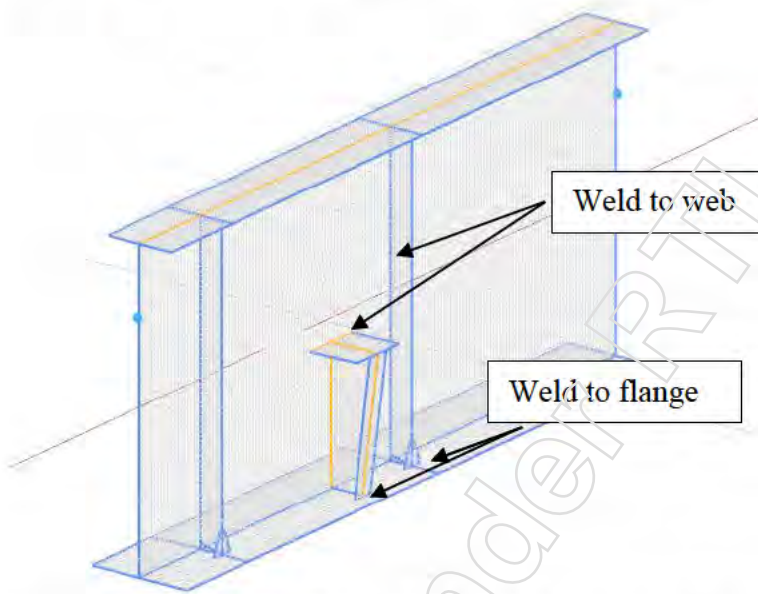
Weld locations considered for Cross Girder stiffeners.
